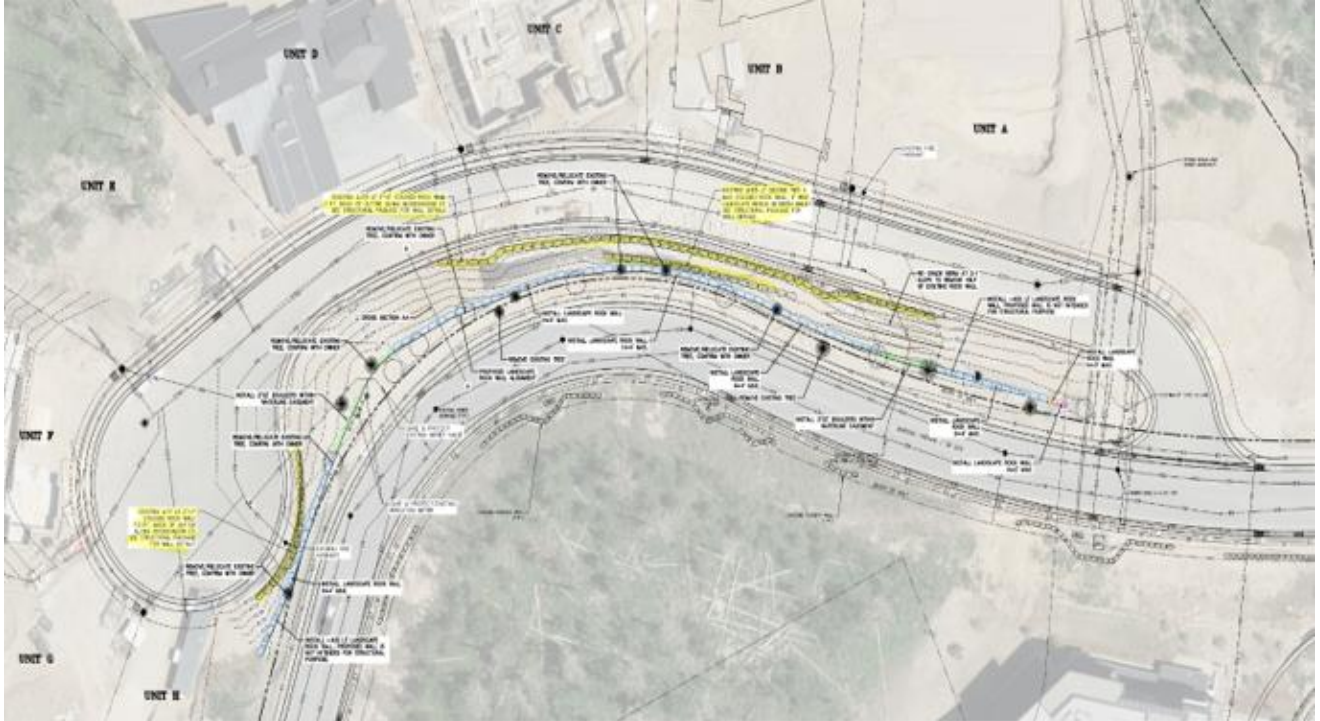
Proposed Retaining Walls Highlighted in Blue, Existing Retaining Walls Highlighted in Yellow
